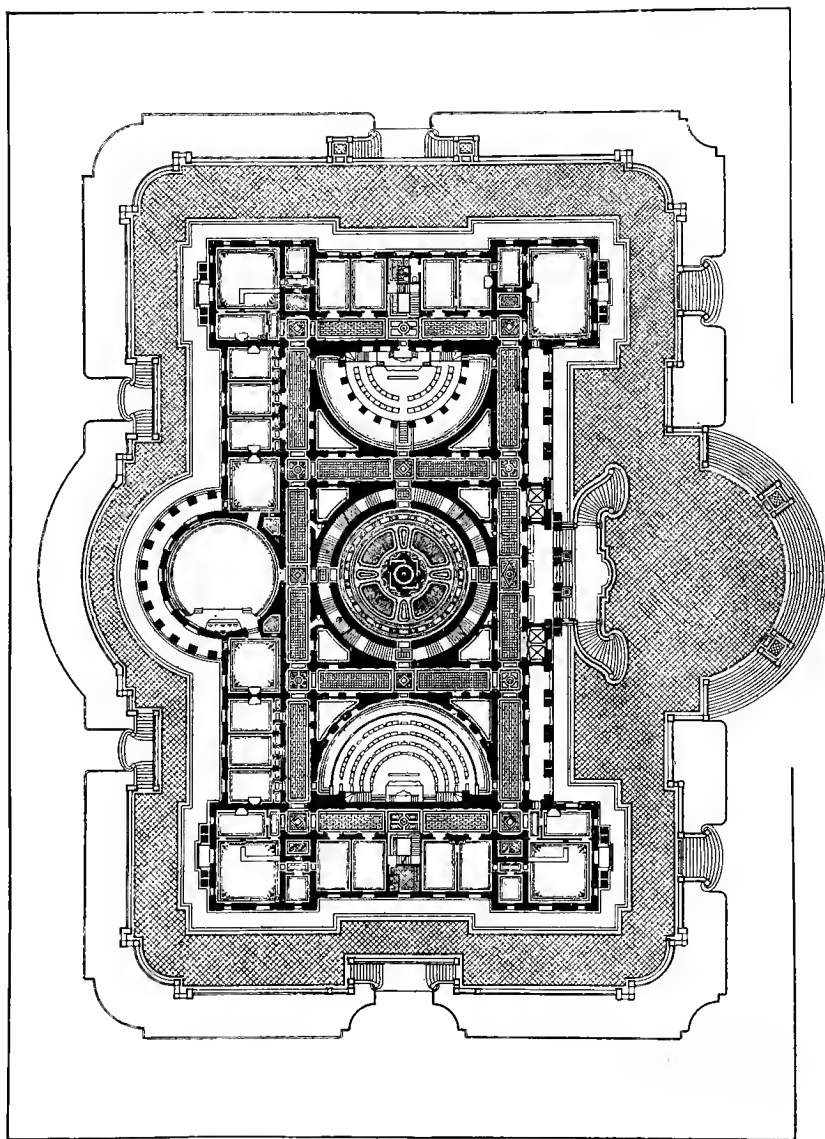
GROUND FLOOR PLAN OF THE WASHINGTON STATE CAPITOL AT OLYMPIA, WASHINGTON.
